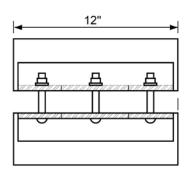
Corrugated Metal Pipe Coupling and/or General Pipe Anchor Assembly
